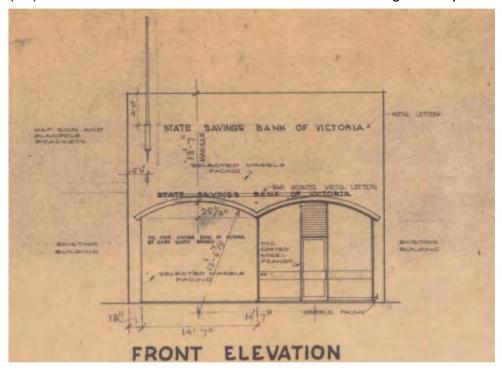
Elevation plan prepared by Best Overend. (Source: Council building file)
